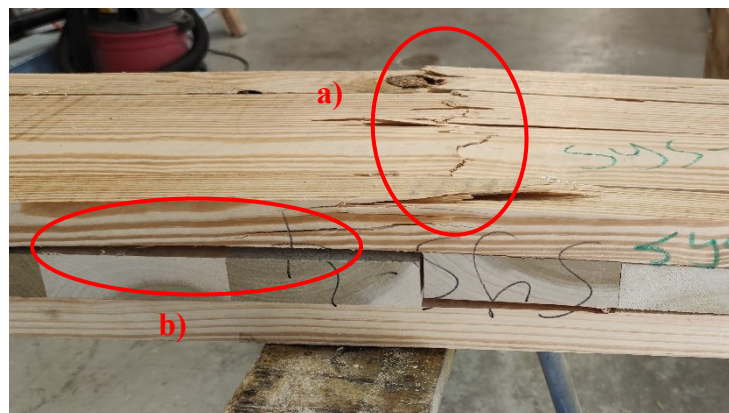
Examples of (a) Bending failure, and (b) Glue failure of tested CLT beams
